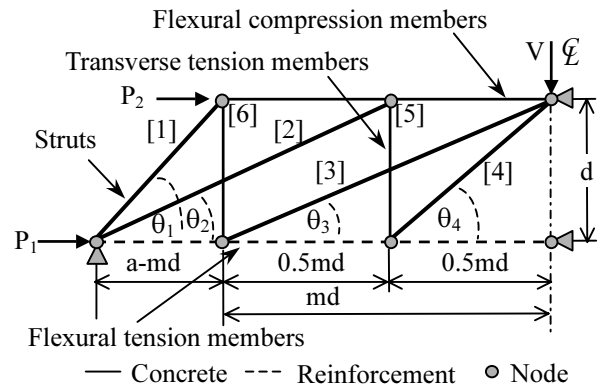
Simplified truss model for a PC beam without transverse reinforcement
